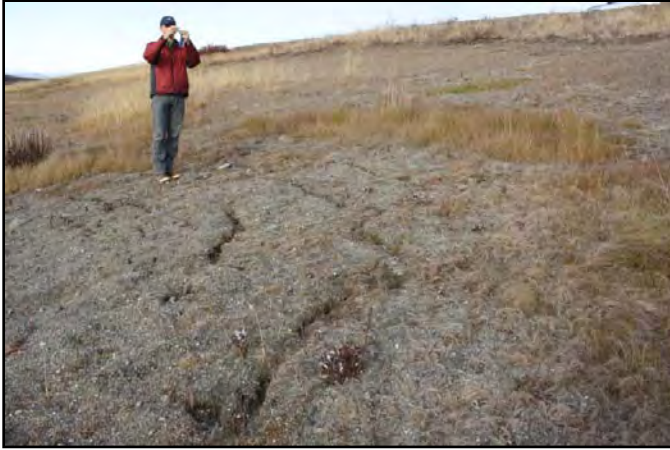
Tension cracks in cutslope along north side of Nome E/W runway..
